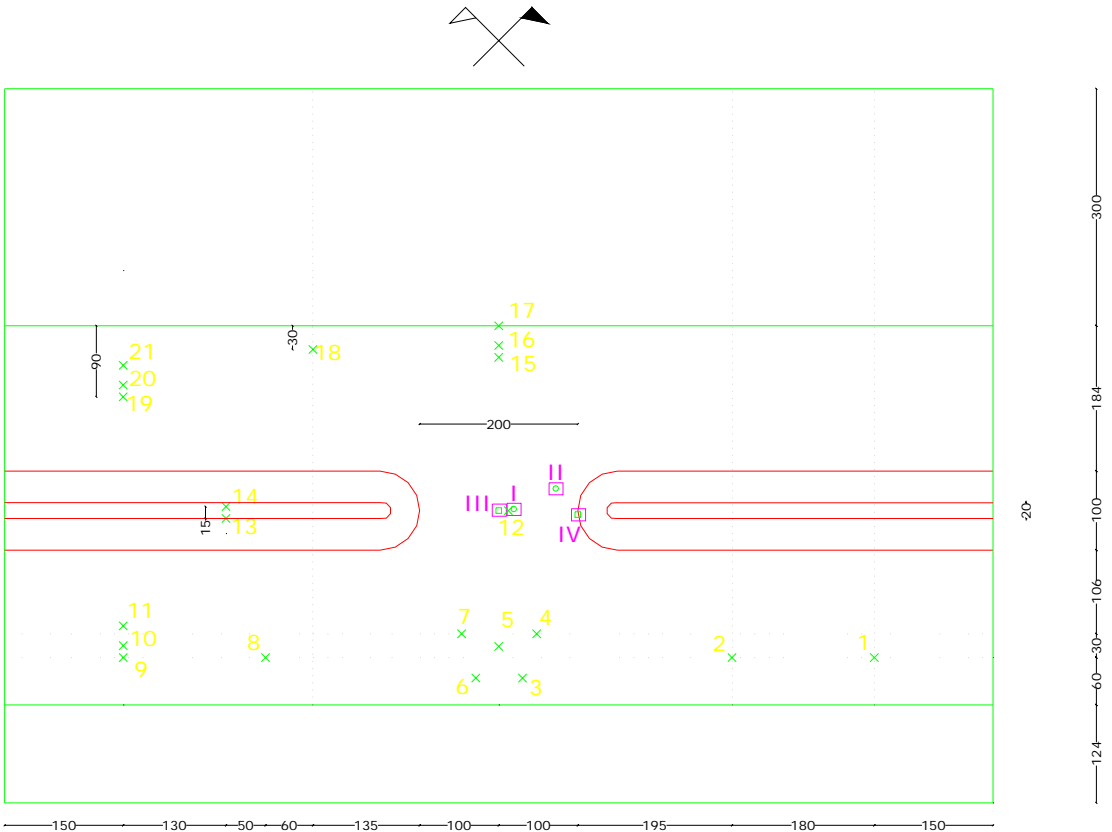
Plan view of Aalborg experimental layout 1 (narrow crest structures)
